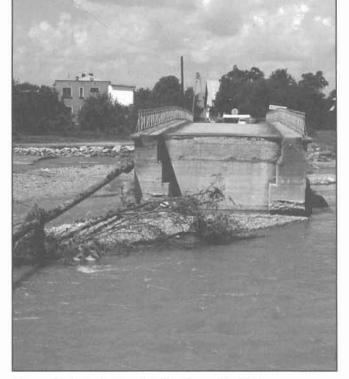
A washed out embankment behind a bridgehead. A 60-meter section of the access road was destroyed (Bystrzyca Dolna town - Bystrzyca River).
